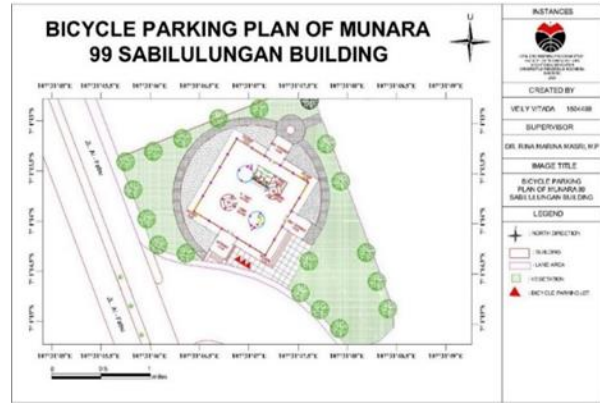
Bicycle Parking Plan at Munara 99 Sabilulungan Building
